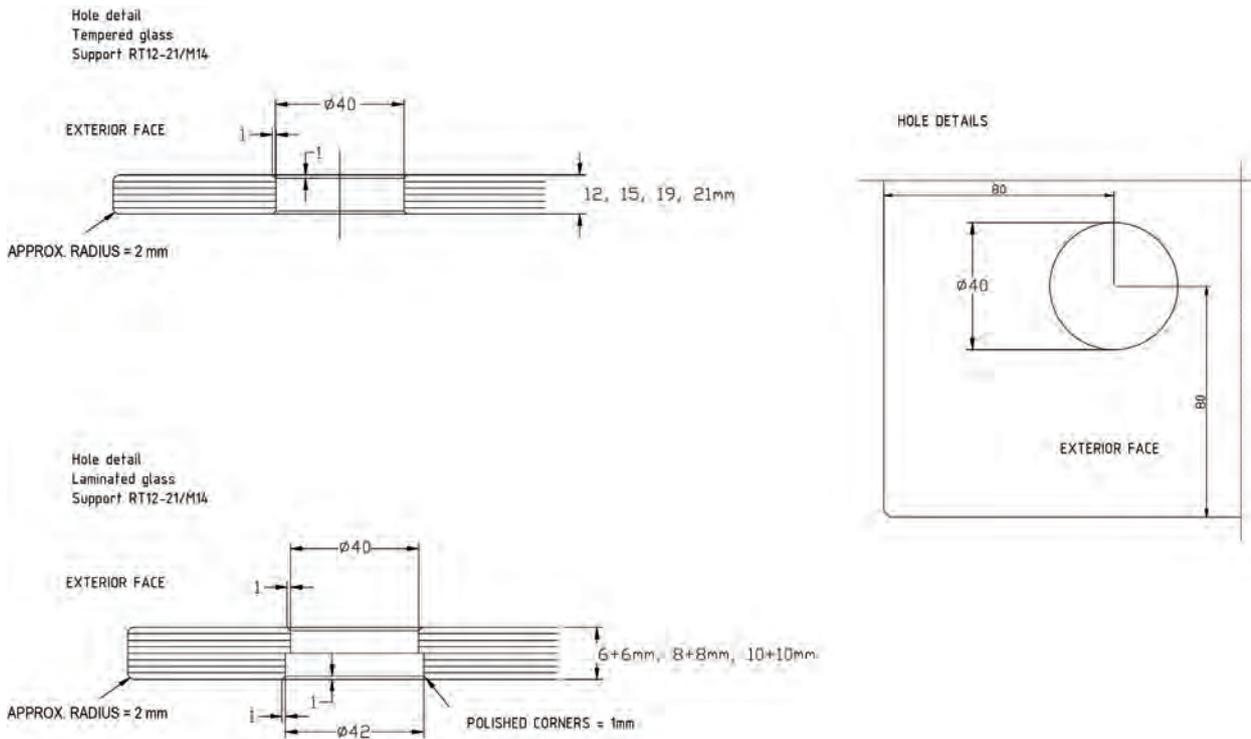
Articulated point support with fixture front plate RT 12-21 M14: hole in the glass
